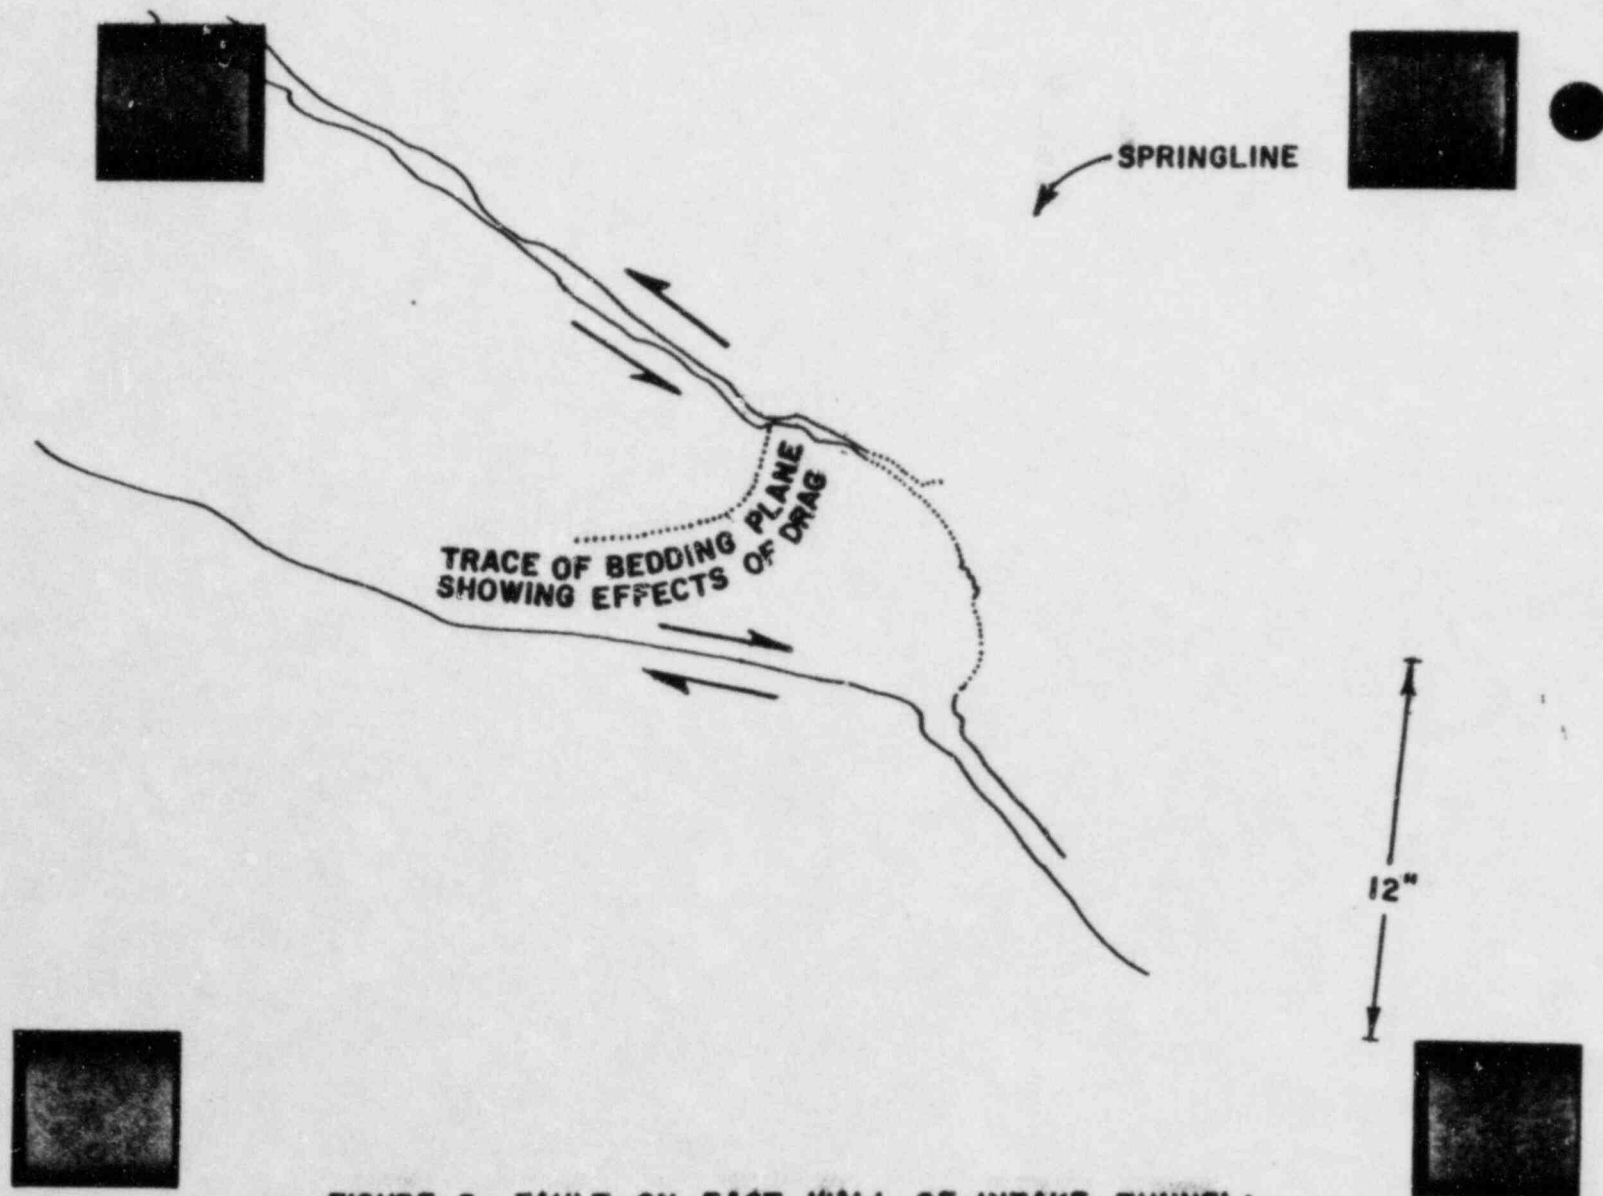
FAULT ON EAST WALL OF INTAKE TUNNEL;
